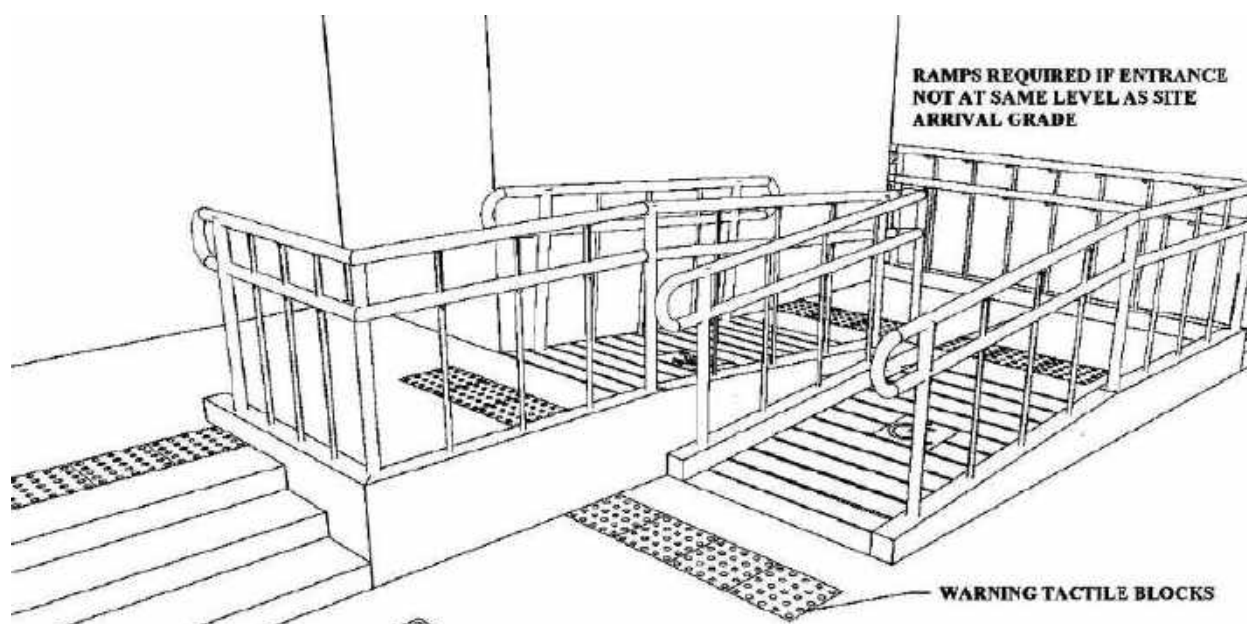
Image above shows an accessible entrance with an accessible ramp with handrails, warning tactile blocks, and signage
